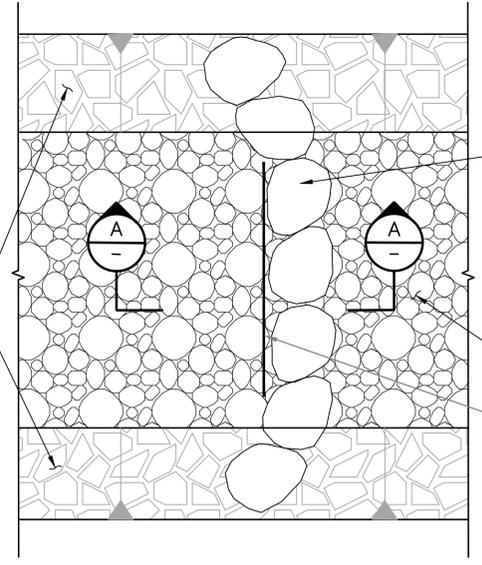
ROCK BAND - TYPICAL PLAN
